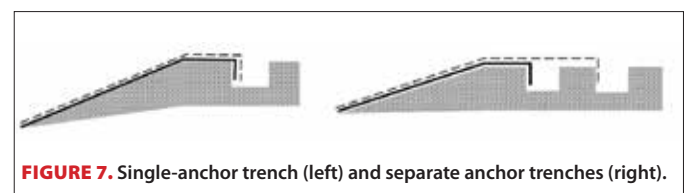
Single-anchor trench (left) and separate anchor trenches (right).
